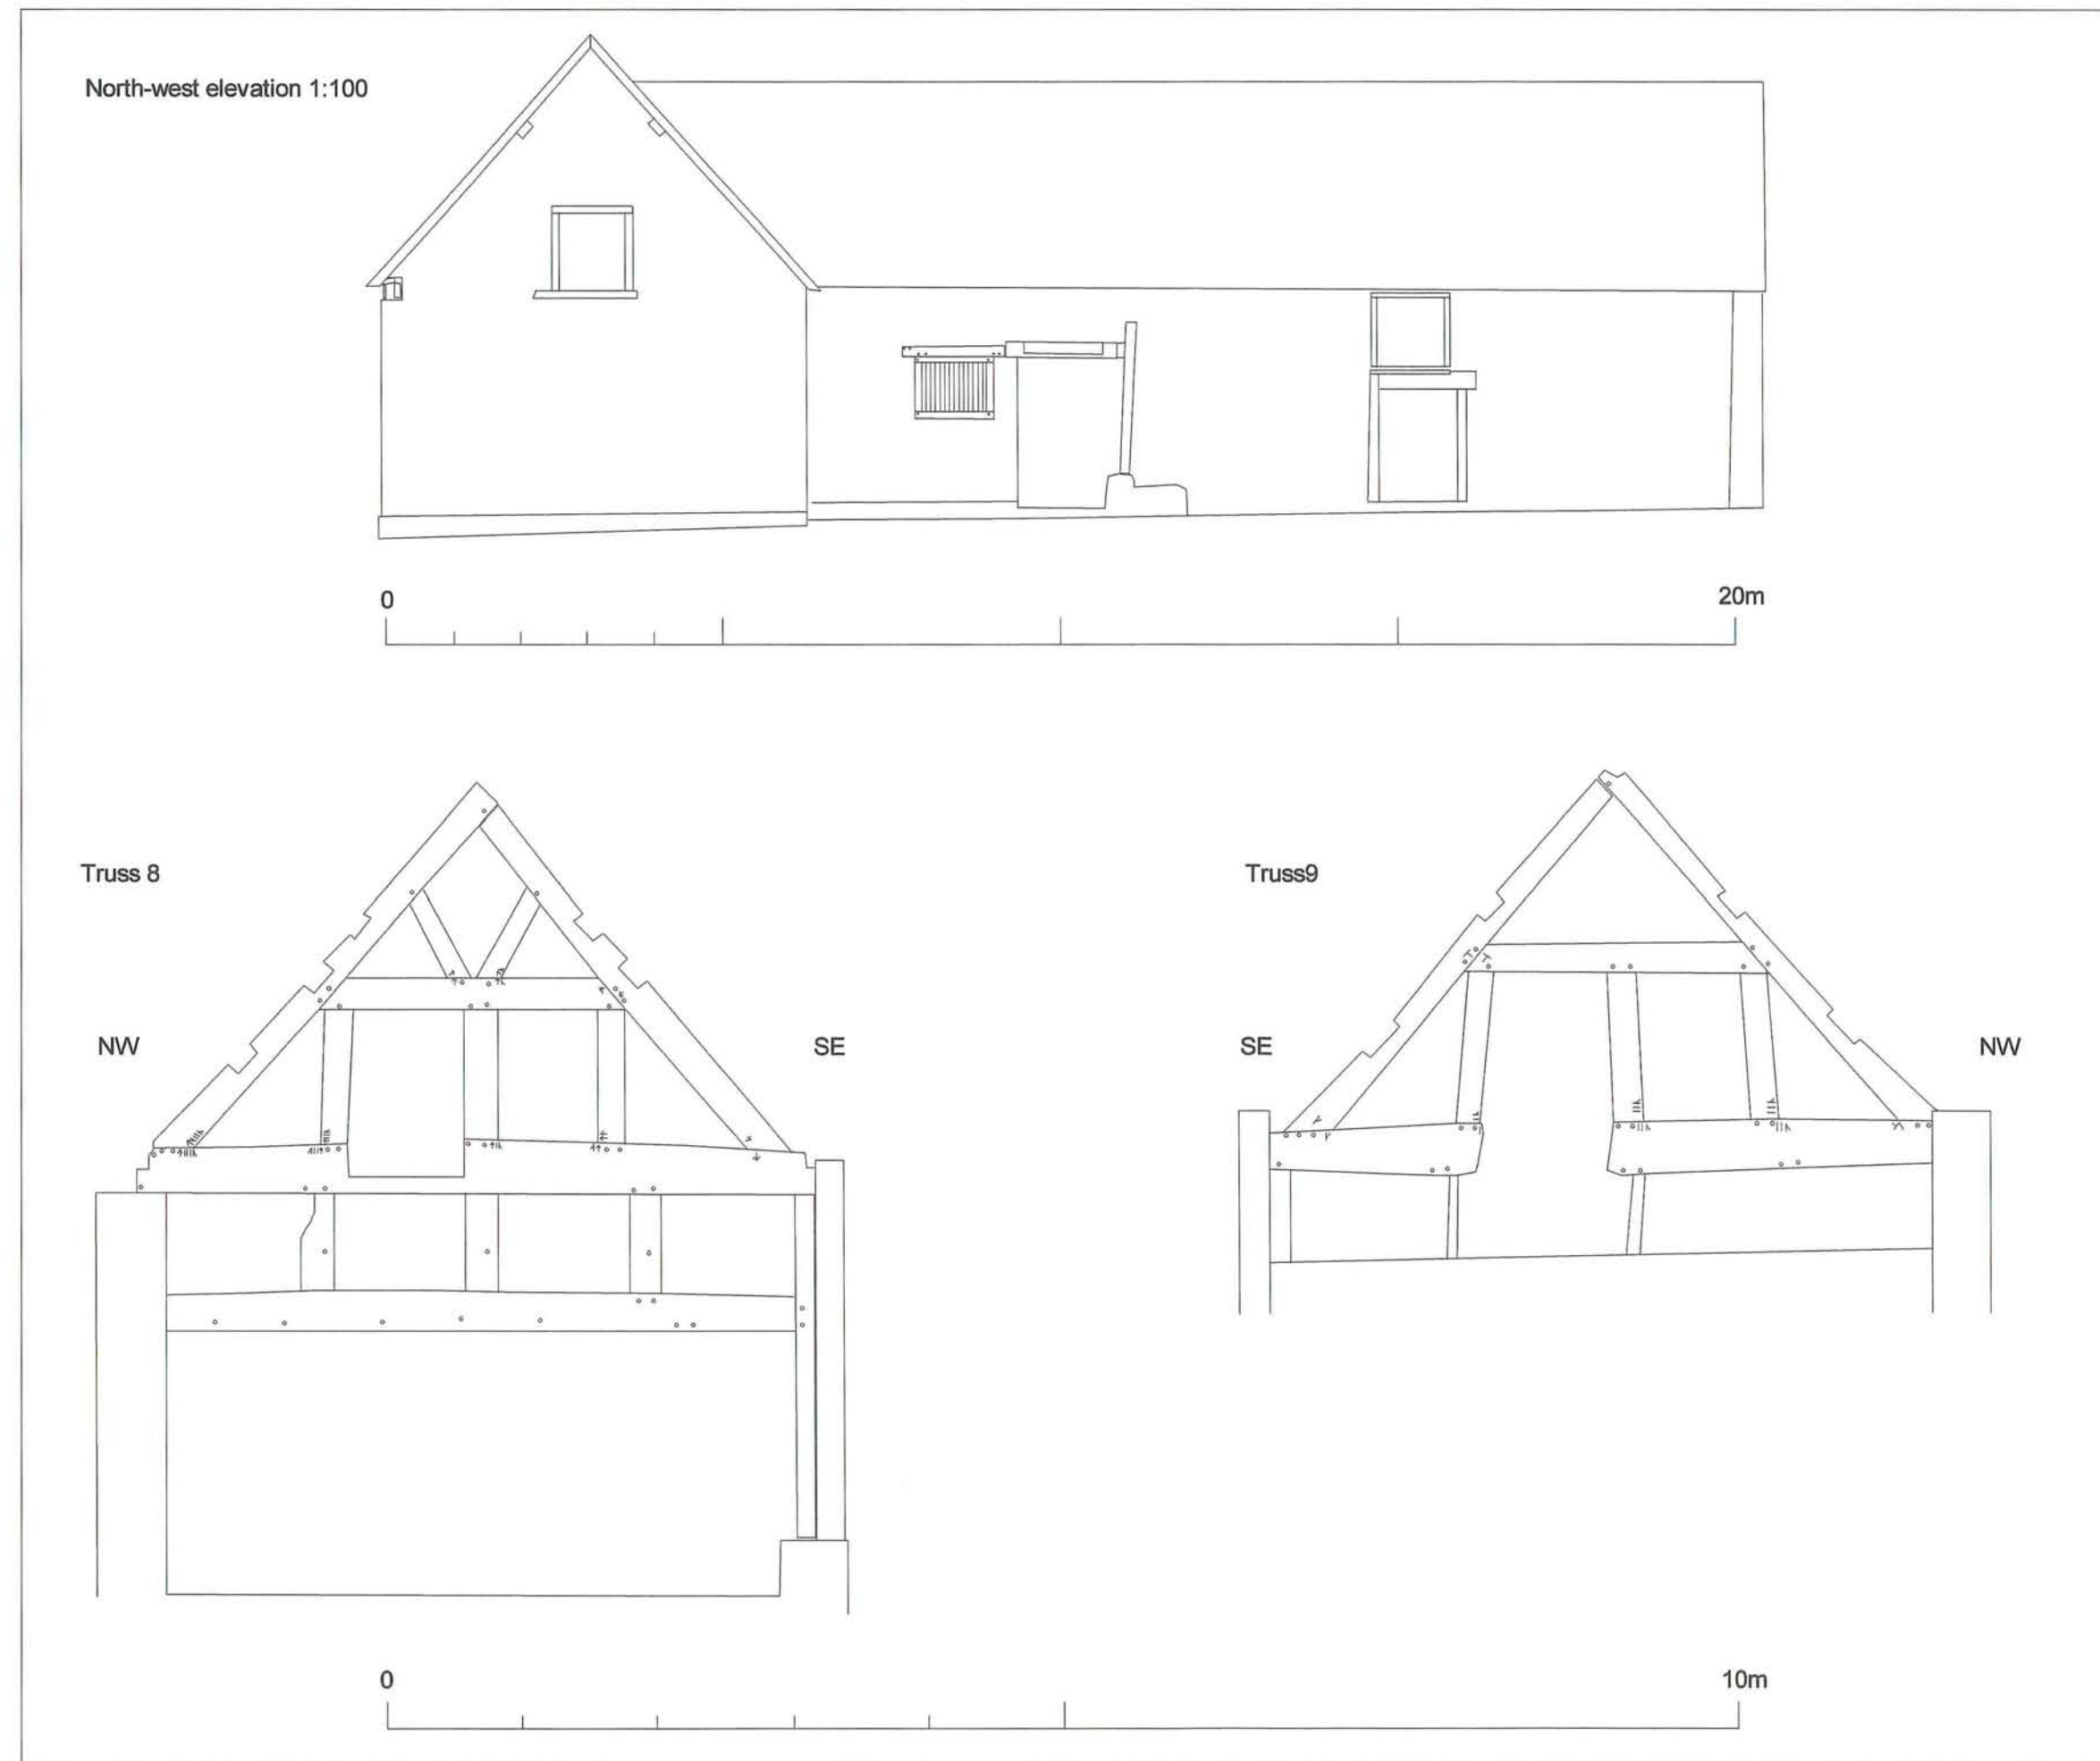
Barn 3 North-west elevation and Trusses 8 and 9
